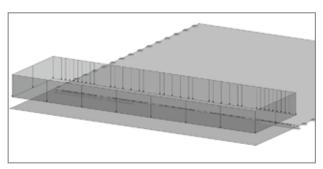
Schöck Isokorb® T type K-E, K-T: 3D view of the load on the balcony; left slab support articulated, right restrained
